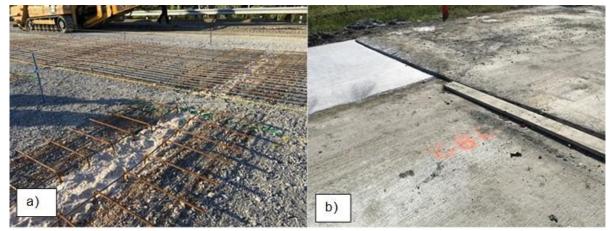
End Points of CRCP: (a) east end tied to anchor lug; (b) free end at west. CRCP = continuously reinforced concrete pavement.
